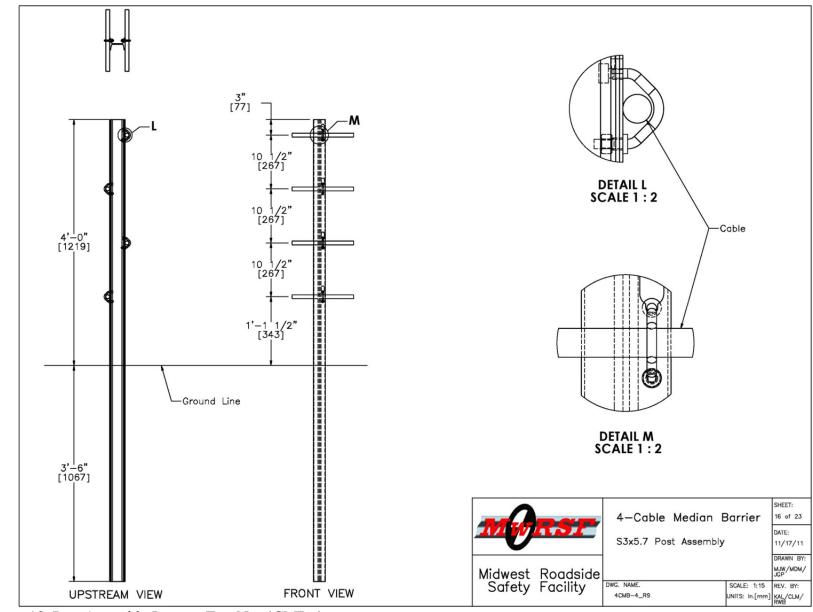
Post Assembly Layout, Test No. 4CMB-4
